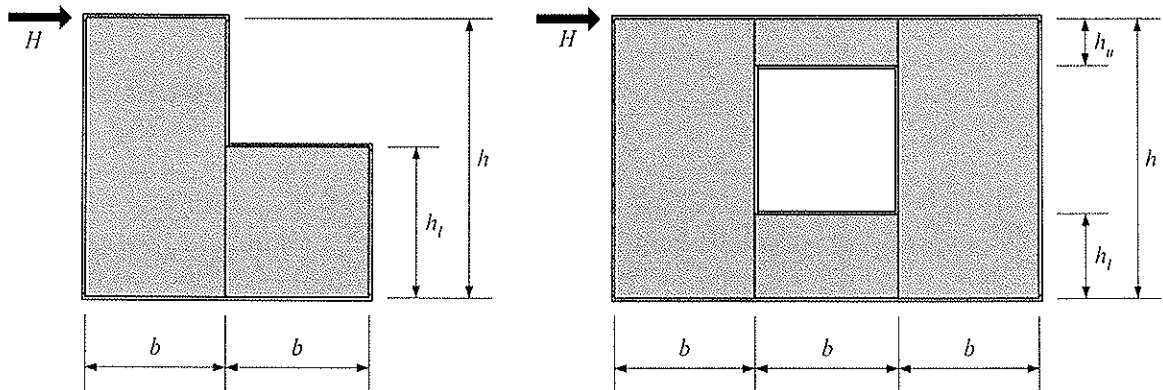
Wall diaphragms tested (type 1 to the left, type 2 to the right).
